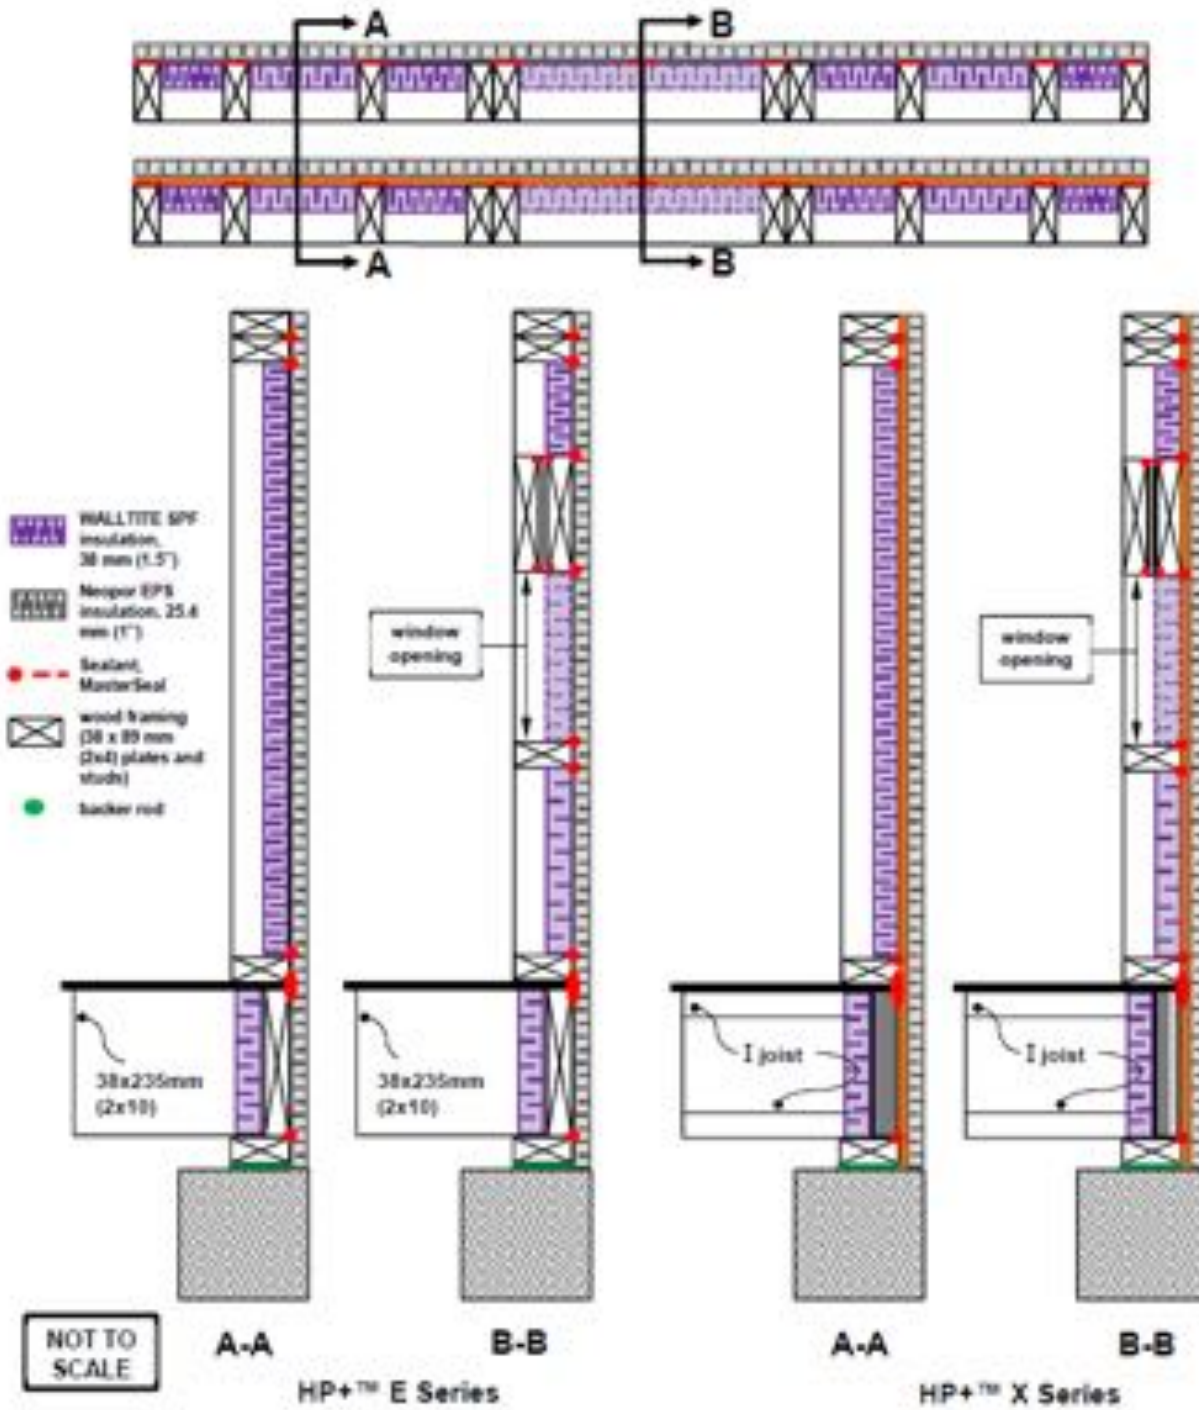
Additional details of “MasterSeal® NPI™” at wood frame joints
